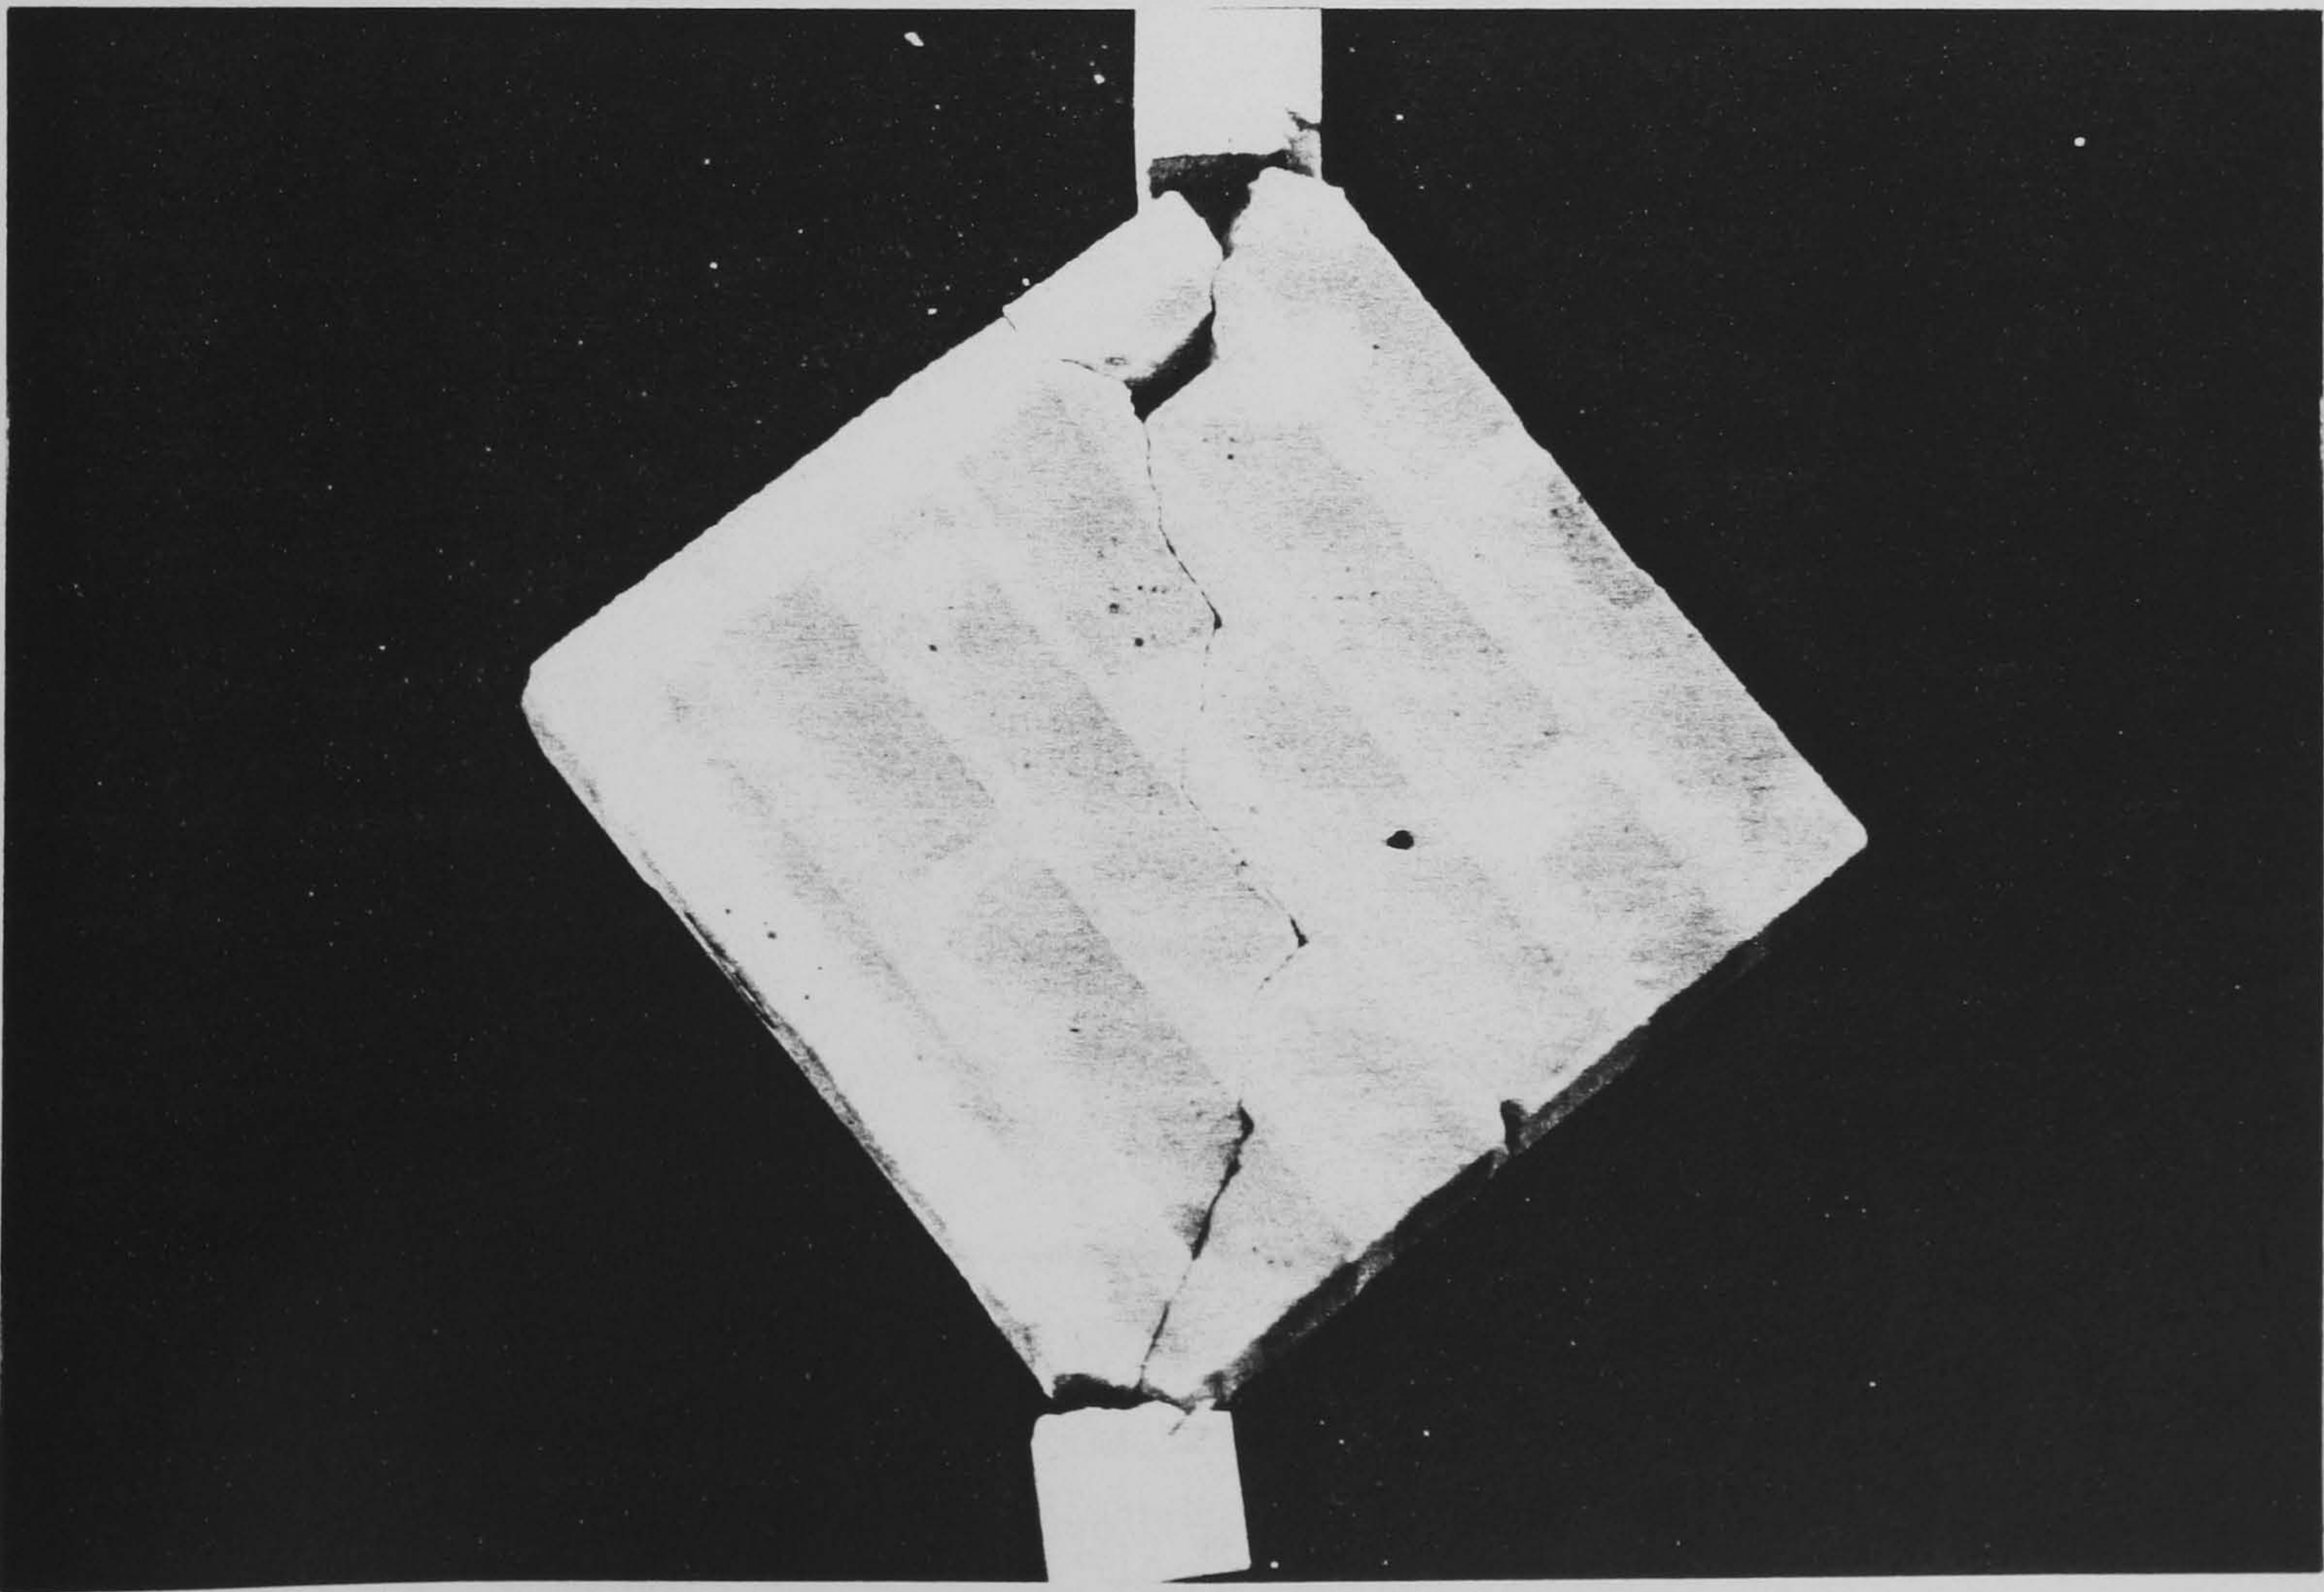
Diagonal tensile splitting cracking in small masonry wallette
